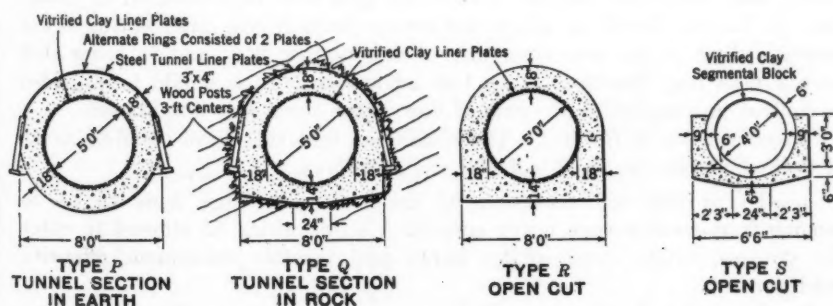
ALUM CREEK INTERCEPTING SEWER, CIRCULAR SEWER SECTIONS.
